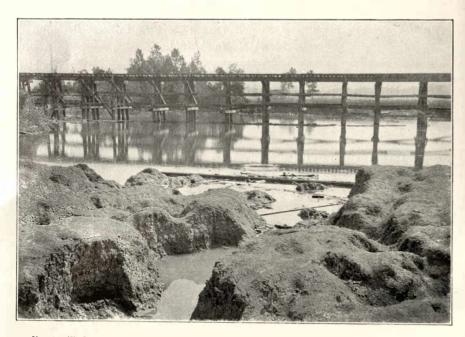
Washout at Summers ditch crossing, Big Four railroad, Evansville to Mt. Carmel division.
